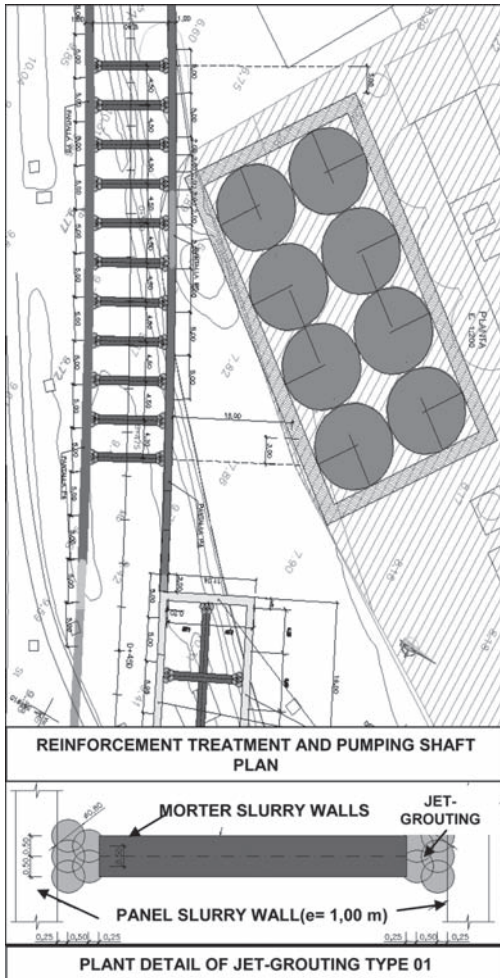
Ground plan of the silos and props at the foot of the screen walls of the line tunnel and initial pumping shaft.
